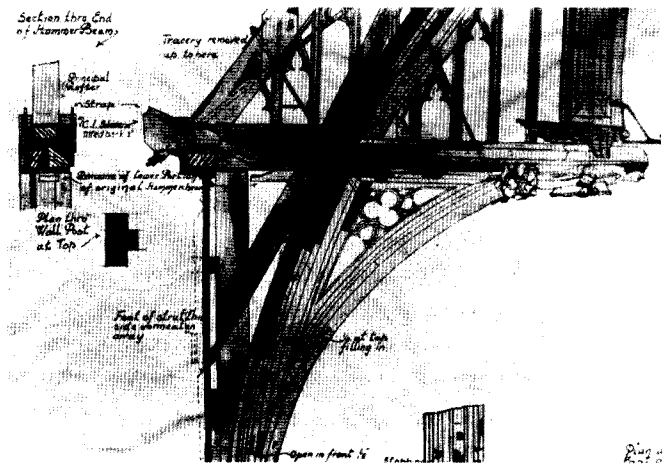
Sir Frank Baines, section and elevation of truss at wall head, Westminster Hall roof. Schedule no. 27 made in preparation for truss reinforcements. Note the air gap between the masonry wall and wall post with blocking providing lateral support at its midpoint.
